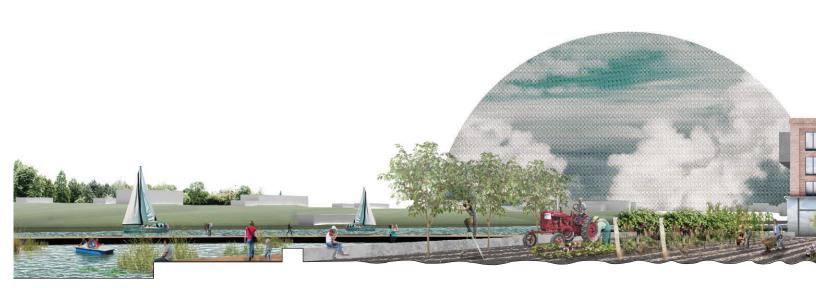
Cross Section Detail -Agricultural Storage and Garden
